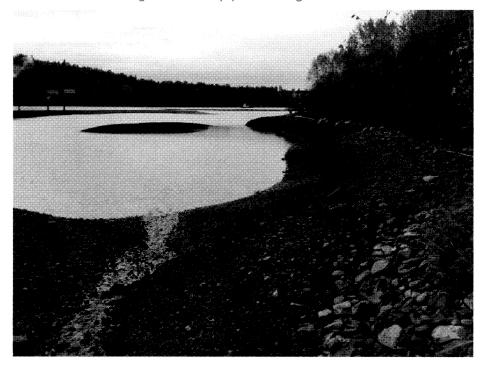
West side of Northeast Basin looking south (construction waste on foreshore)
